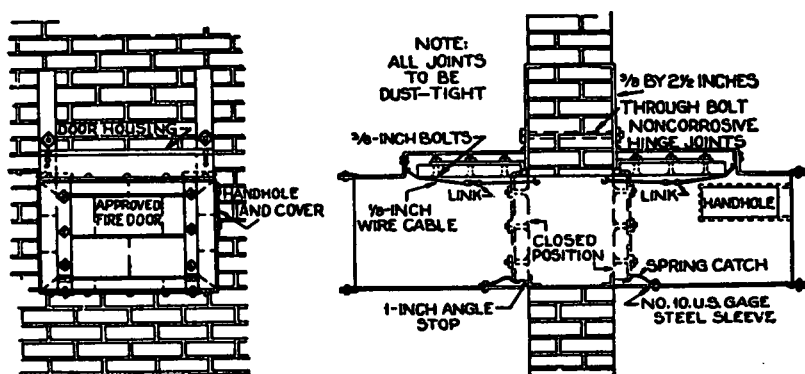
Suggested type of automatic hinged fire door for duct passing through opening in fire wall.
